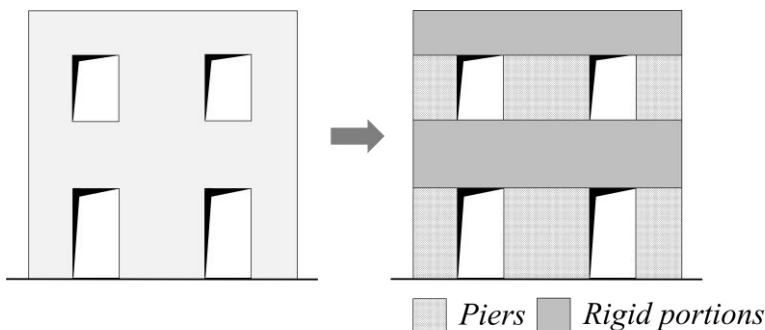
Modelling of a masonry wall through the POR method: identification of the piers and rigid portions
